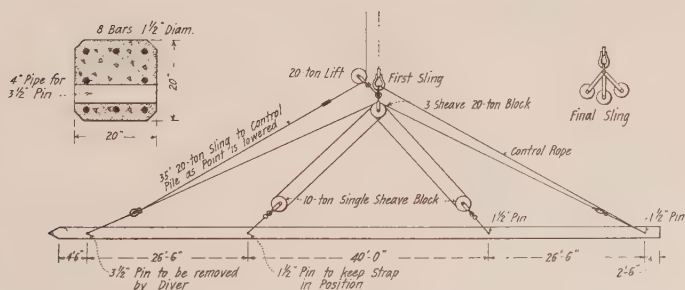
METHOD OF SLINGING 100-FT. CONCRETE PILES USED AT AUCKLAND, NEW ZEALAND.
